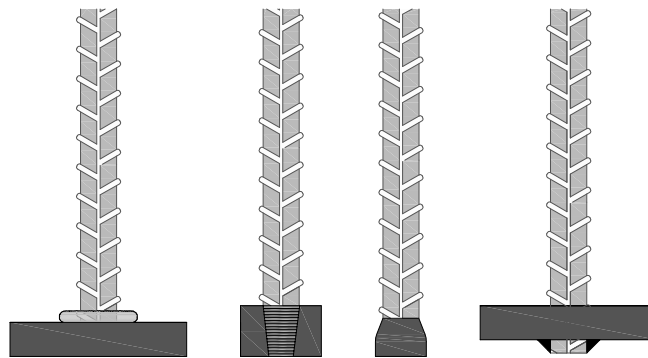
Mechanical anchorage details. From the left to the right: friction-welding, threaded connection, forging, traditional weld
